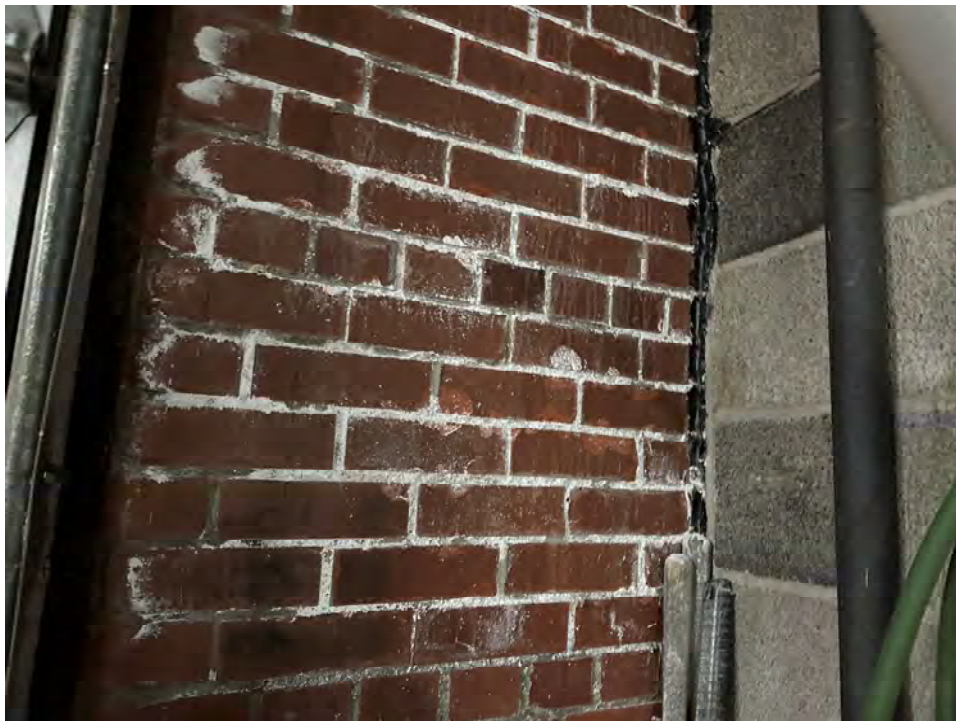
Efflorescence build up and staining on interior surface of solid brick pier (inside building at Photo 9 location)
